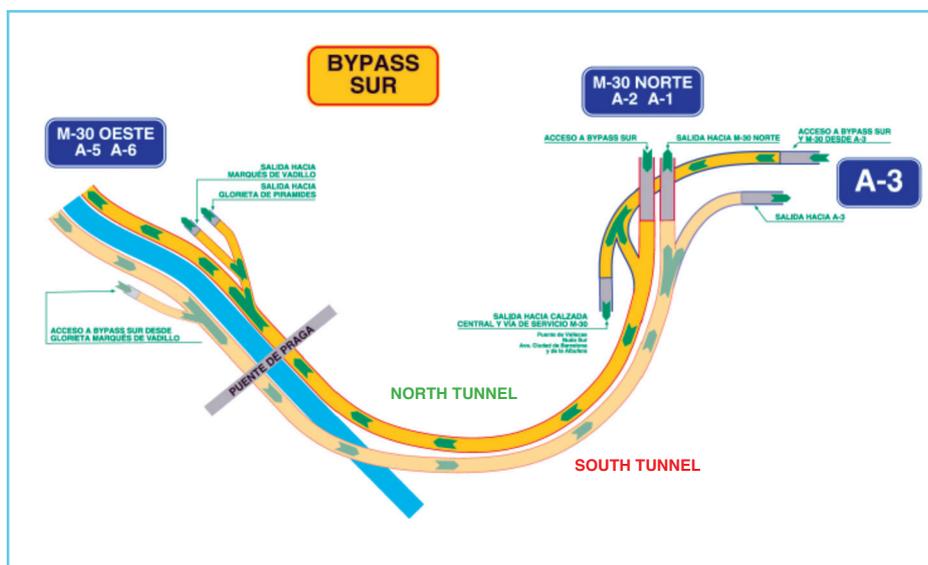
Plan of the north and south tunnels of the M-30 South By Pass.
